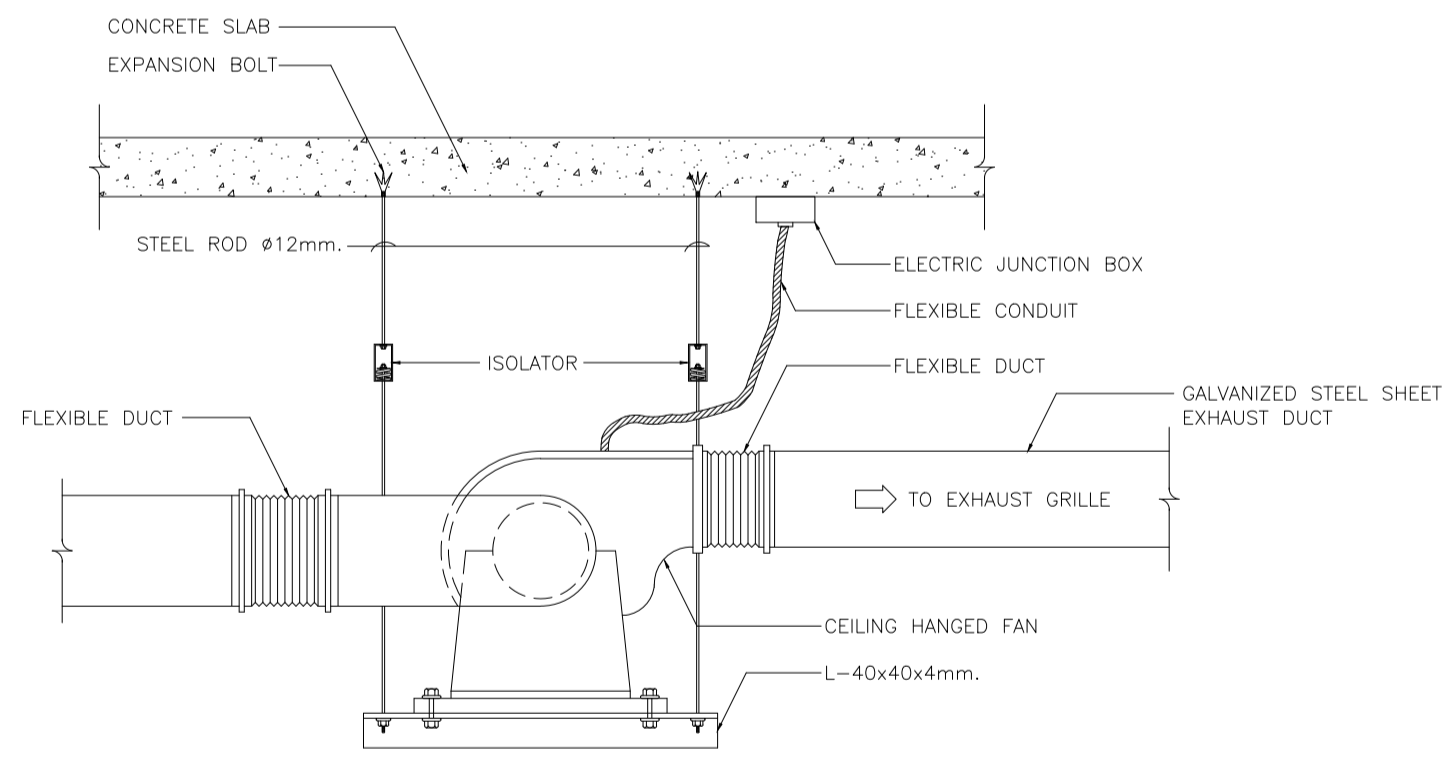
DETAIL OF CENTRIFUGAL FAN INSTALLATION (CEILING MOUNTED TYPE)
